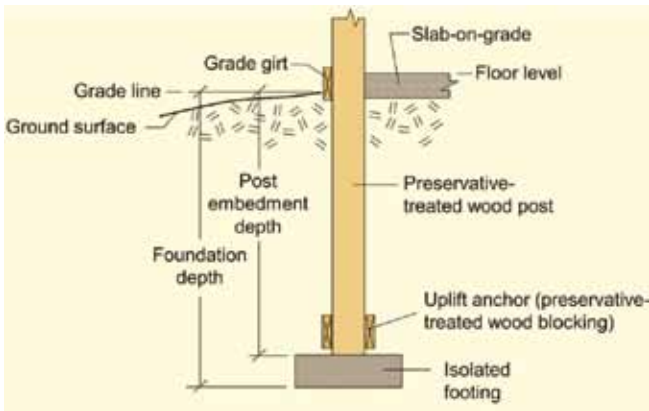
Post foundation featuring preservative-treated grade girts, wood posts and wood blocking for uplift anchorage. The American Wood Protection Association's use category for grade girt (or splash plank) is UC4A, and for the post and uplift anchor, UC4B. (From American Society of Agricultural and Biological Engineers S618, Post Frame Building System Nomenclature, fig. 22.)
